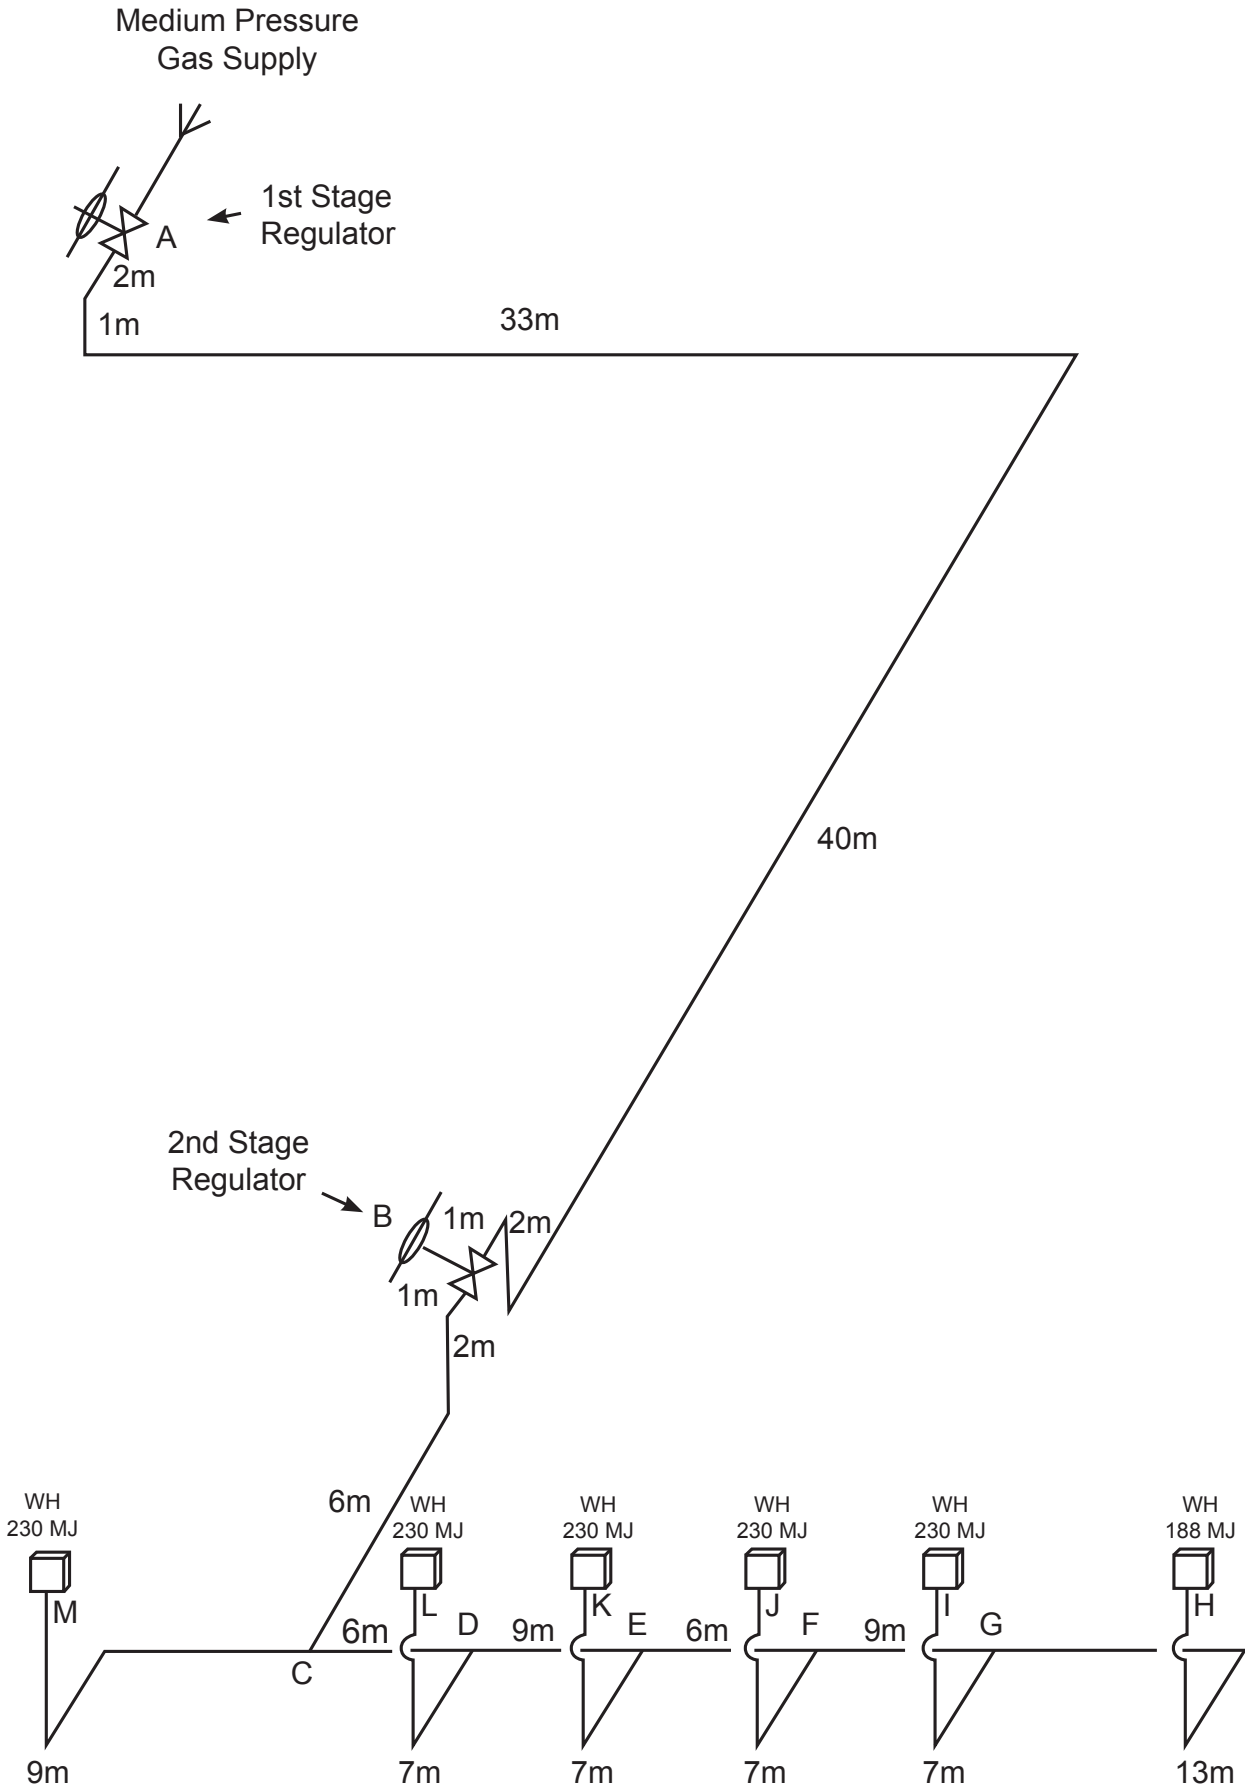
Pipe sizing for LPG (propane) in steel pipe
